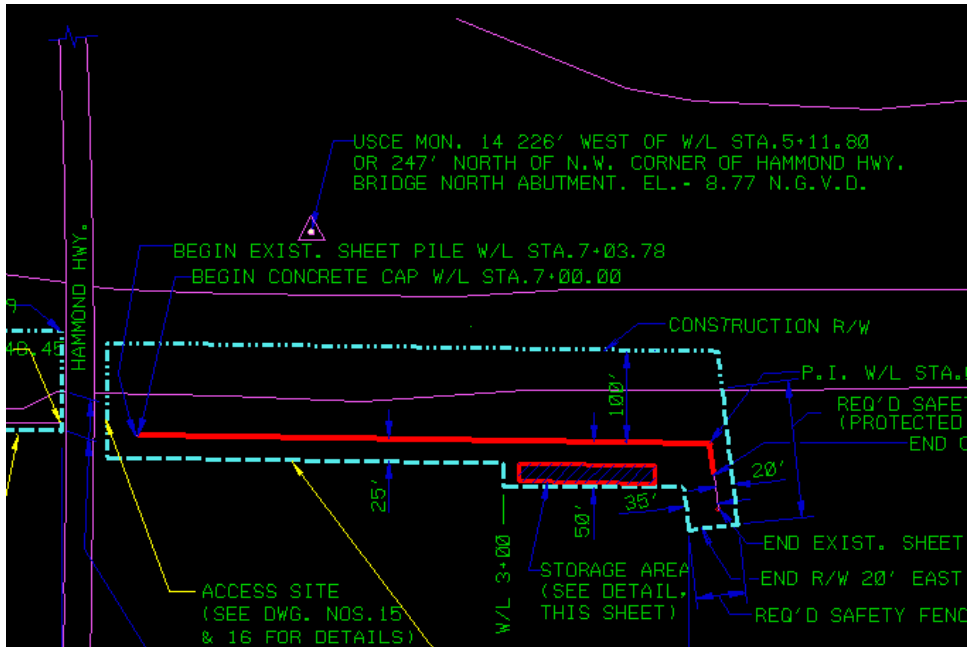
17th Street Canal Reference Benchmark USACE MONUMENT 14 near Hammond Hwy
